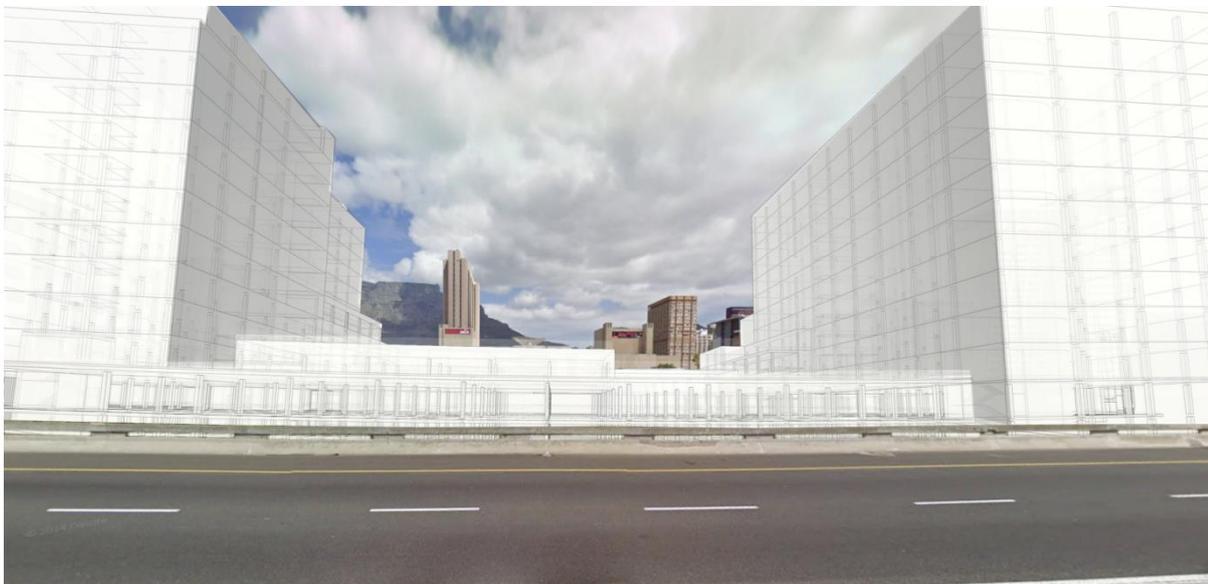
View 3A: PROPOSED VIEW FROM NELSON MANDELA BOULEVARD TRAVELLING WEST, LOOKING DIRECTLY TOWARDS THE SITE
